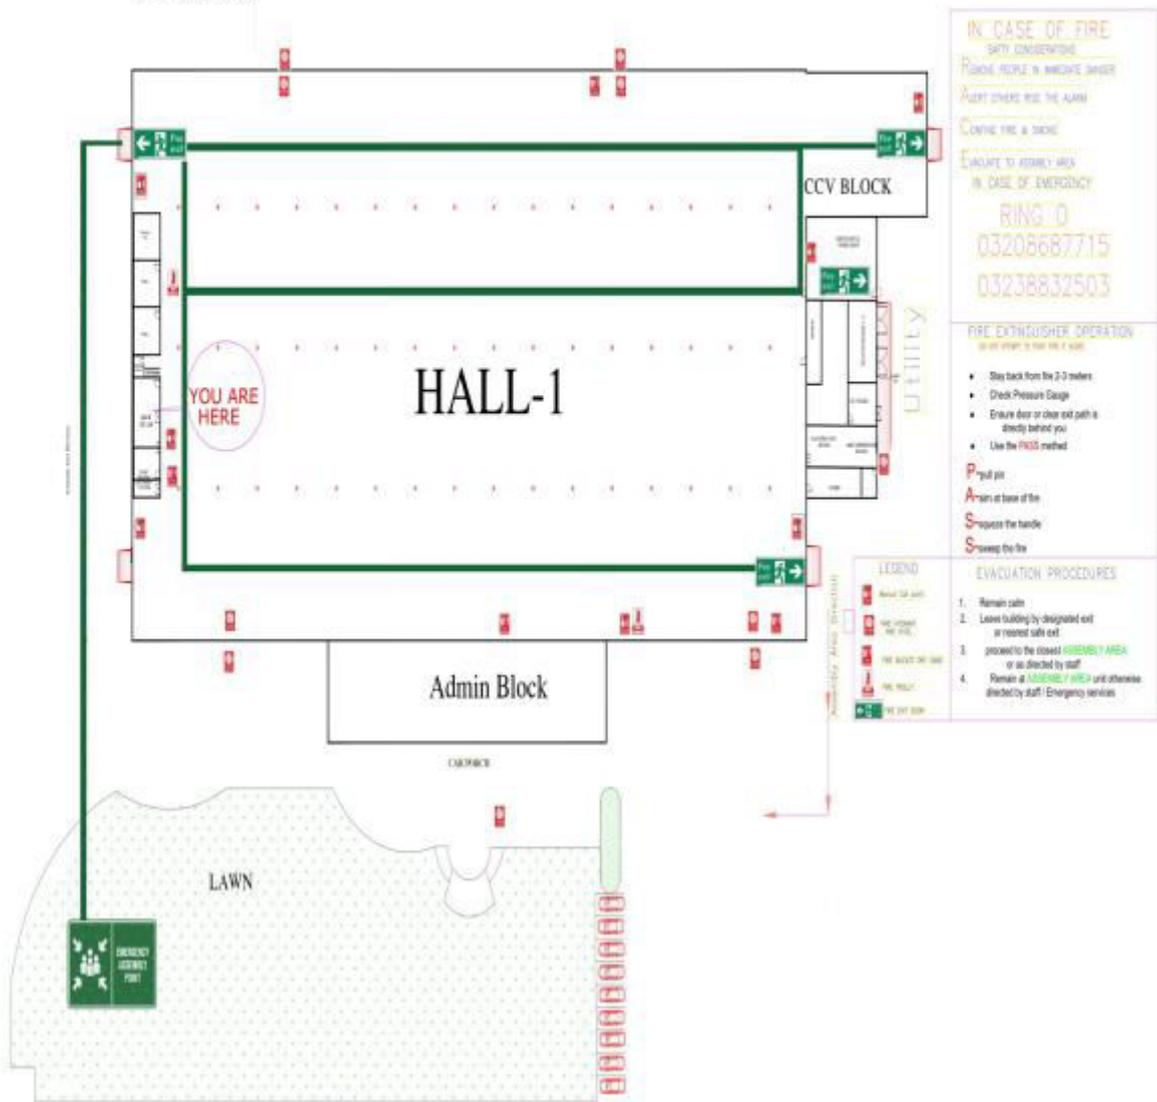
Evacuation Plan for Hall-1, Meeting Room
